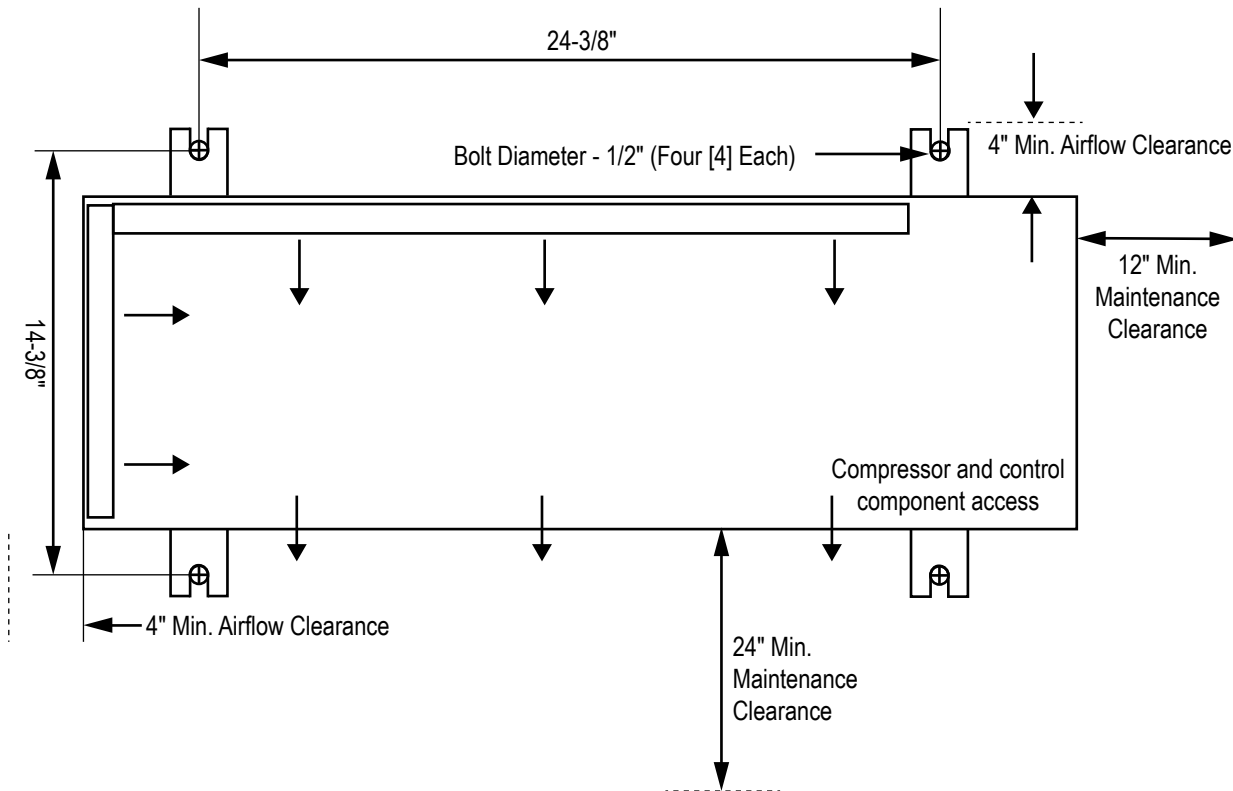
Outdoor Unit—Mounting and Service Clearances (Elevation View).
